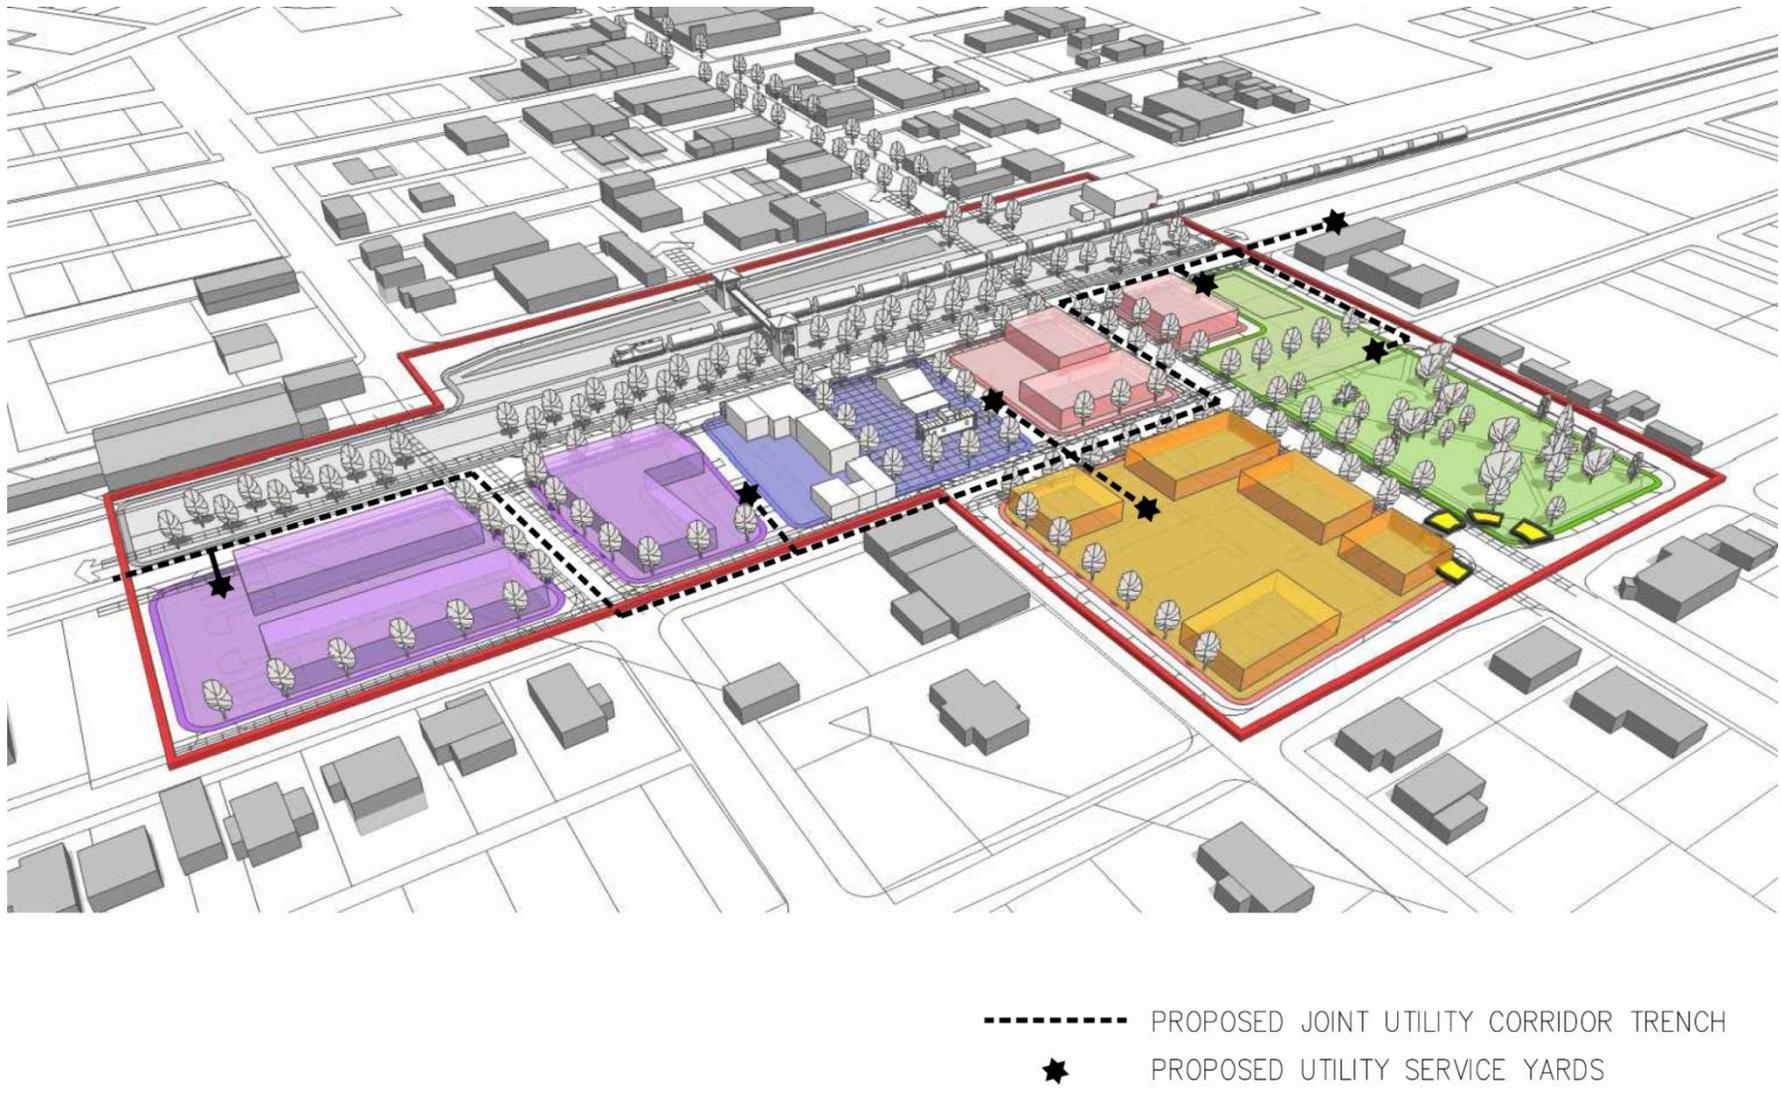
Infrastructure Concept Plan – Underground Utilities
